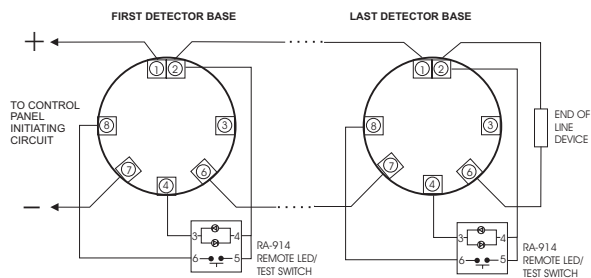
2WRLT/2WRLTC Wiring with Remote Indicator and Test Switch
